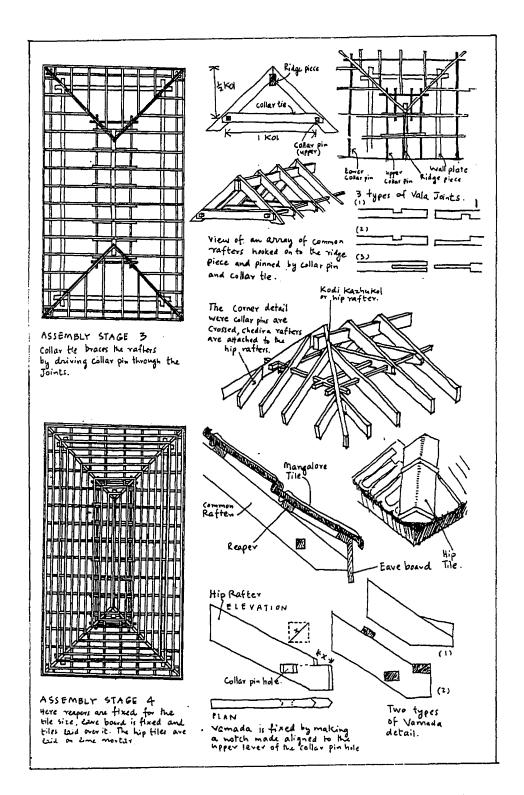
Details of collar tie, collar pin, 'vamada', eaveboard, reapers and tile cladding.
